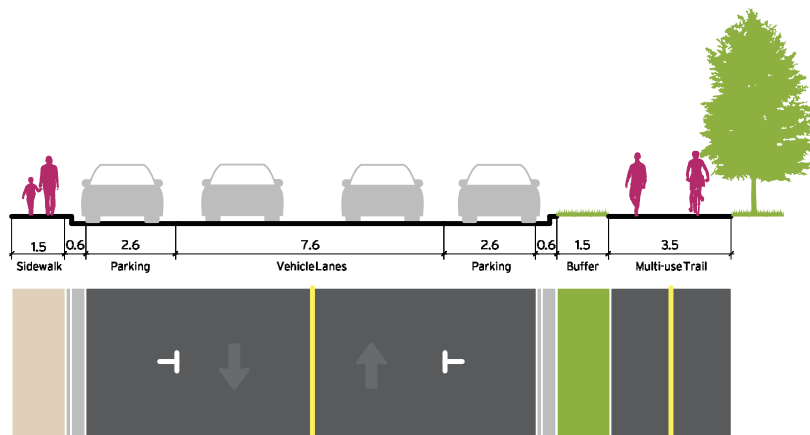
| URBAN MOBILITY WITH BIKE ROUTE STREET SECTIONS - NEWCASTLE
